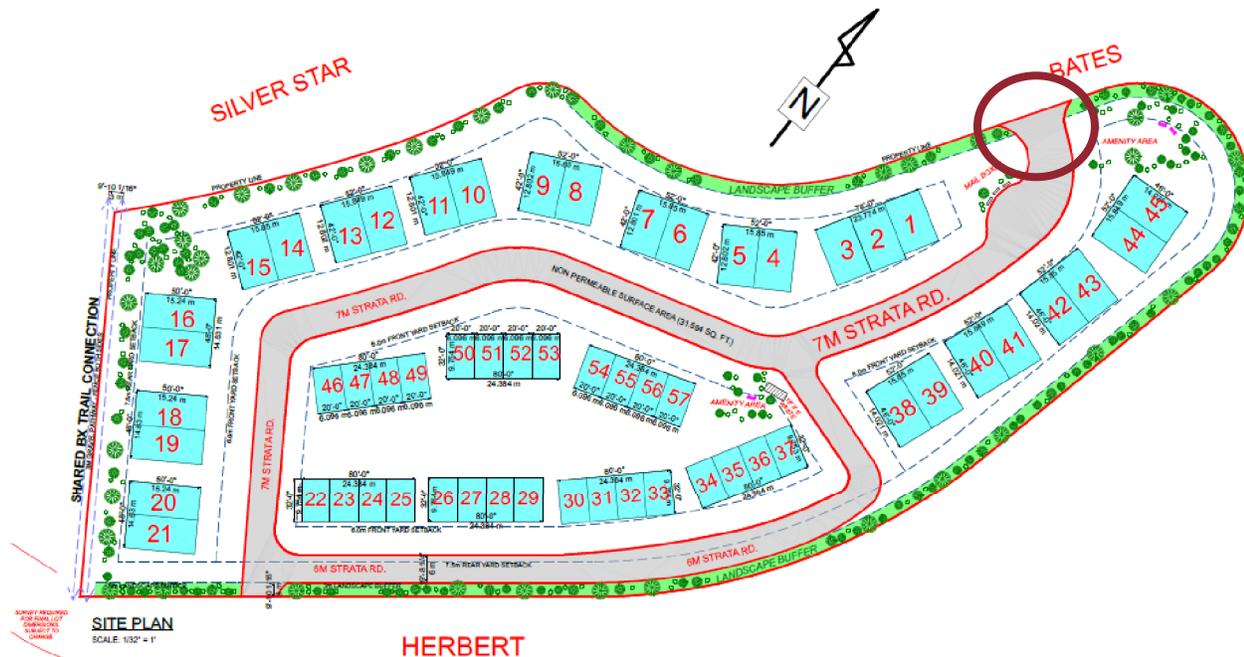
7025 Herbert Rd Site Plan & Access to Bates Rd
